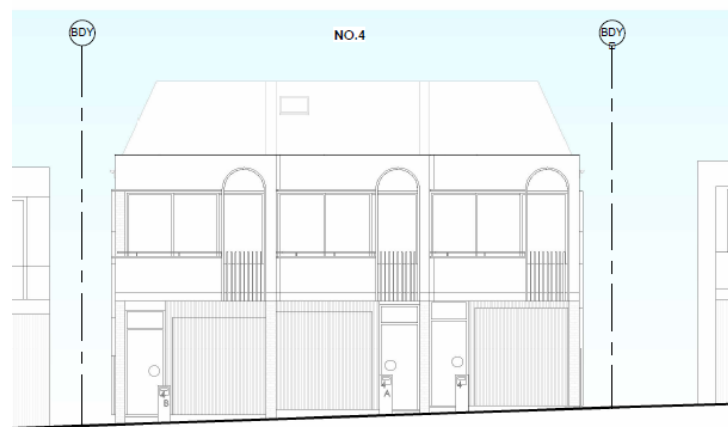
Front elevation to Chester Avenue as refused (Source: Bryan Long Group)
